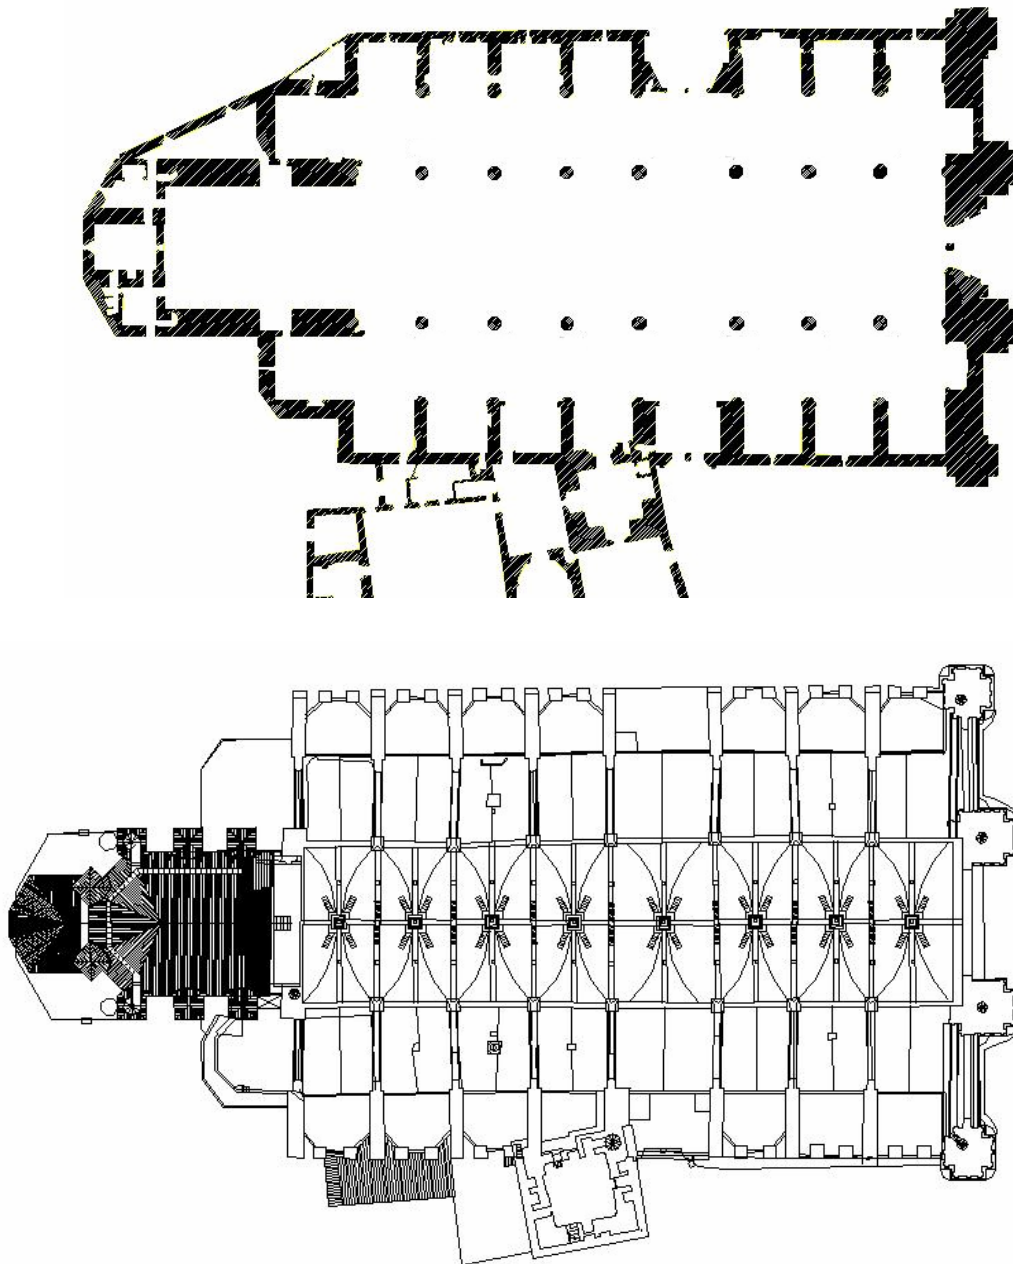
Plan indicating the distribution of piers (above) and vaults (below) of the main nave.
